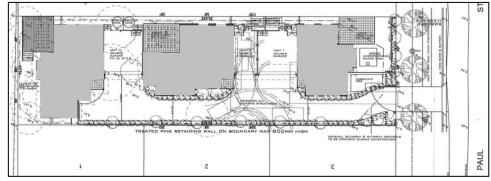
Site Plan - multi dwelling housing (3 dwellings) at 43 Paul Street
